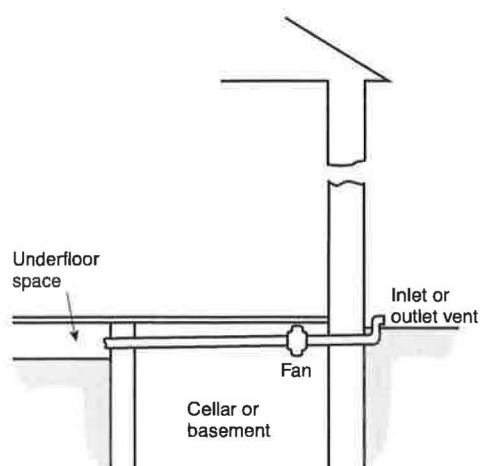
Mechanical underfloor ventilation provided by means of a fan and ducting located within cellar or basement
